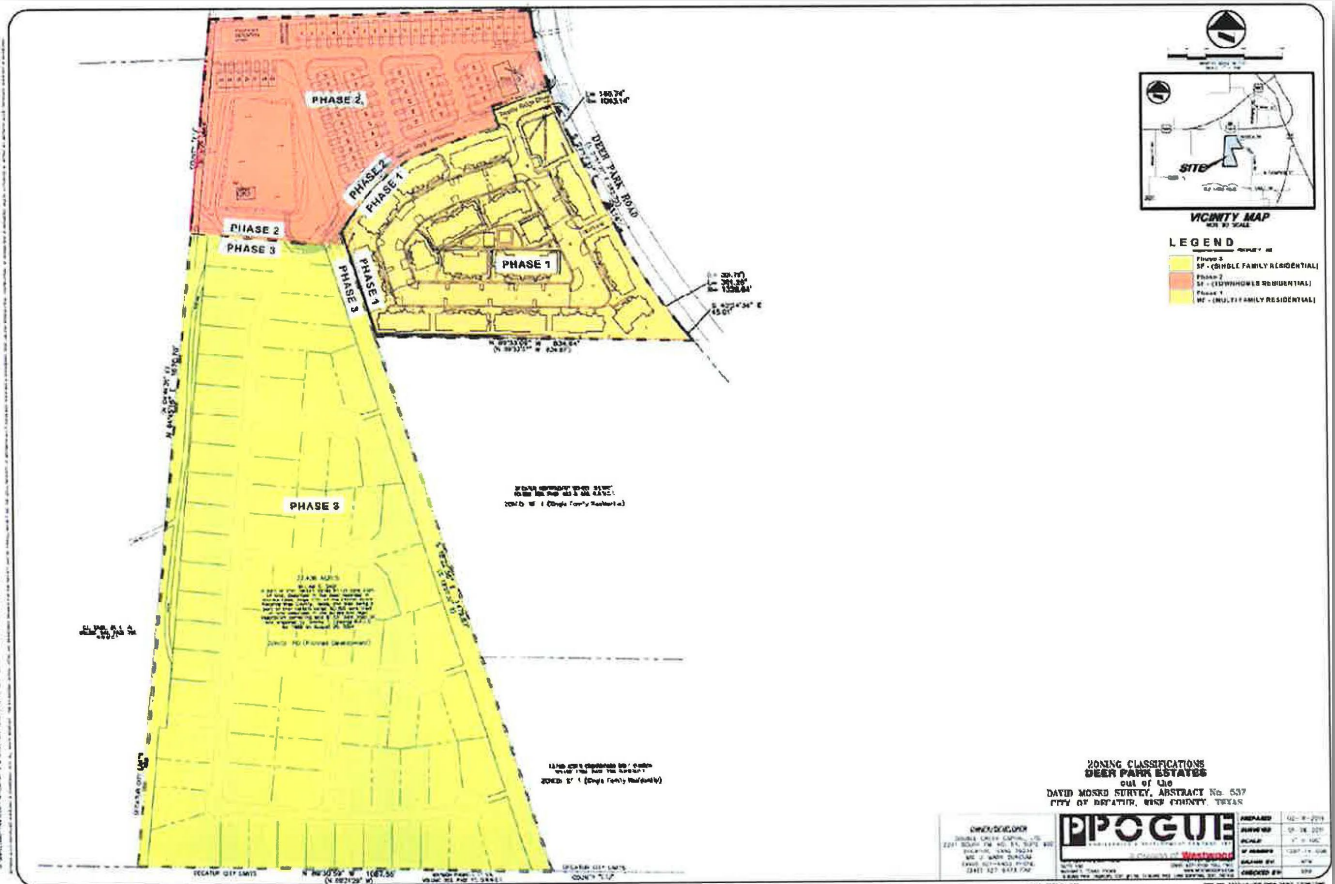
" "C-2" PROPOSED CONCEPT PLAN
